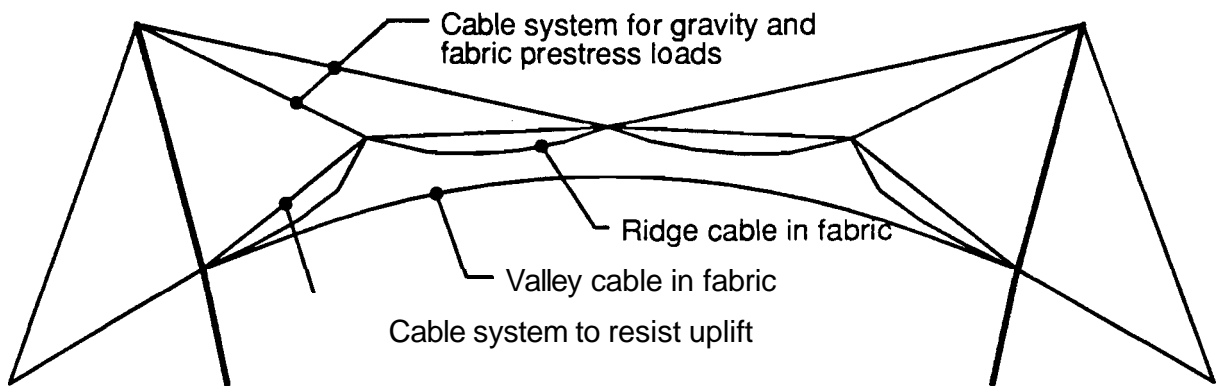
Side Elevation of Membrane Roof with Funicular Cable Truss
